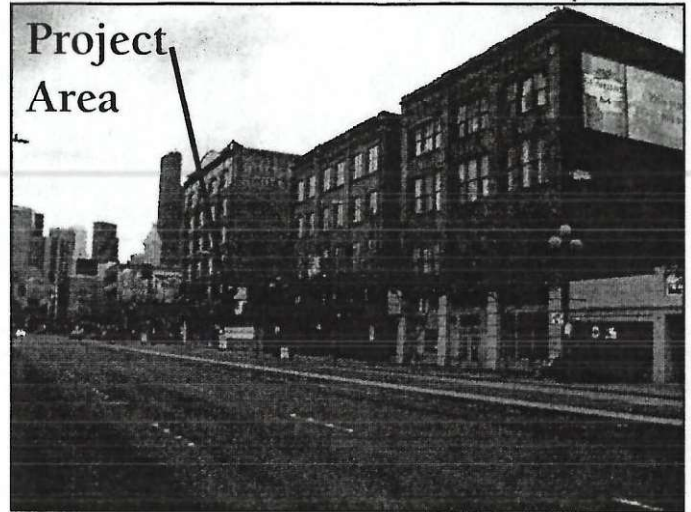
• View B • Viewing North on 1<sup>st</sup> Avenue S from 1101 1<sup>st</sup> Avenue S
